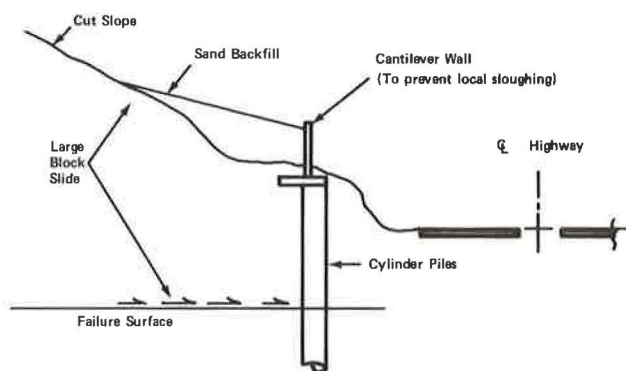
Cylinder pile wall system proposed to stabilize deep-seated slope failure on I-94 in Minneapolis-St. Paul (8.28).
